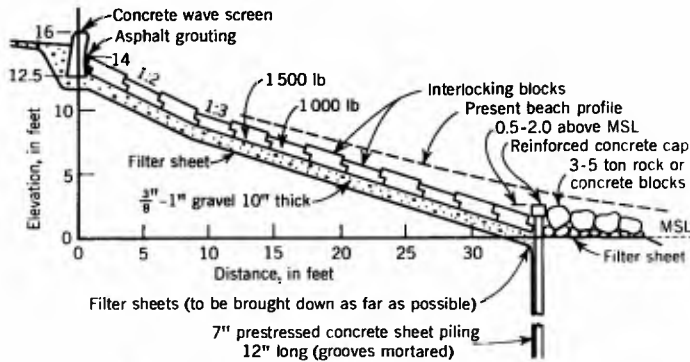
INTERLOCKING CONCRETE BLOCK ("CHECKER BOARD") REVETMENT, FLA.
